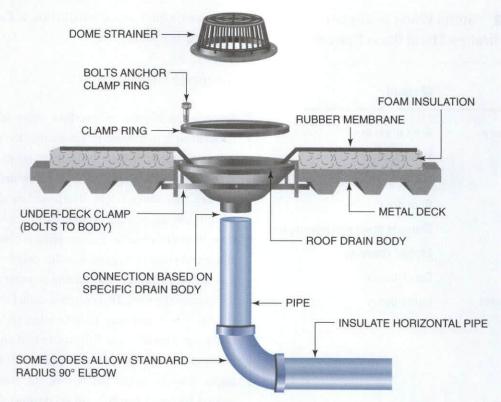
A basic roof drain installation on a metal deck with a rubber membrane roof
